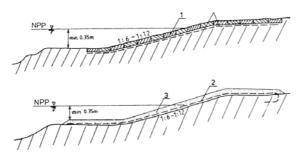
Examples of a simple watering site construction: I - concrete slabs, rods or wooden boards, 2 - geotextiles,3 - sand
